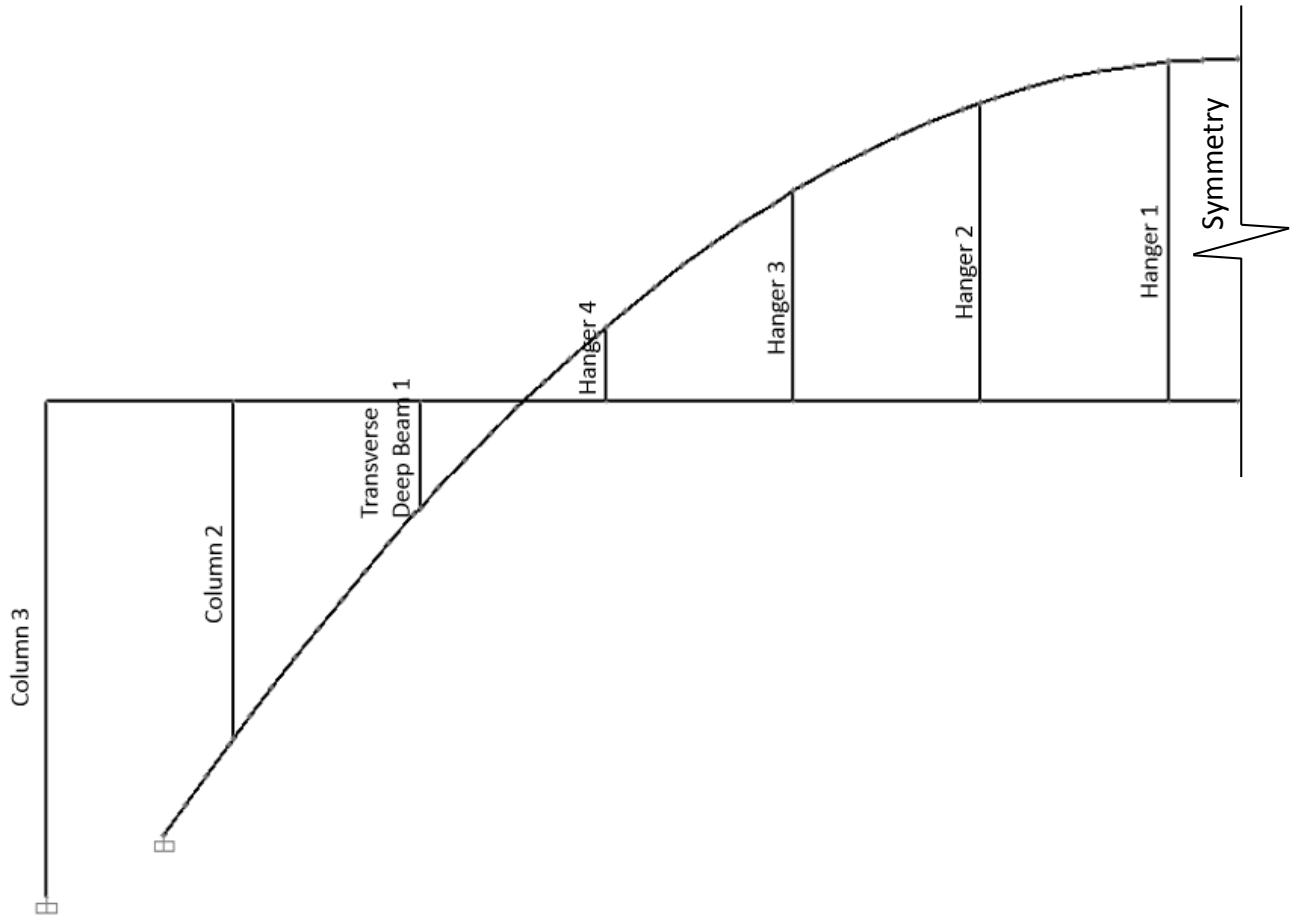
Spans IV, V, and VI East End Naming Convention (SAP 2013) (Duplicate - Figure 5)
